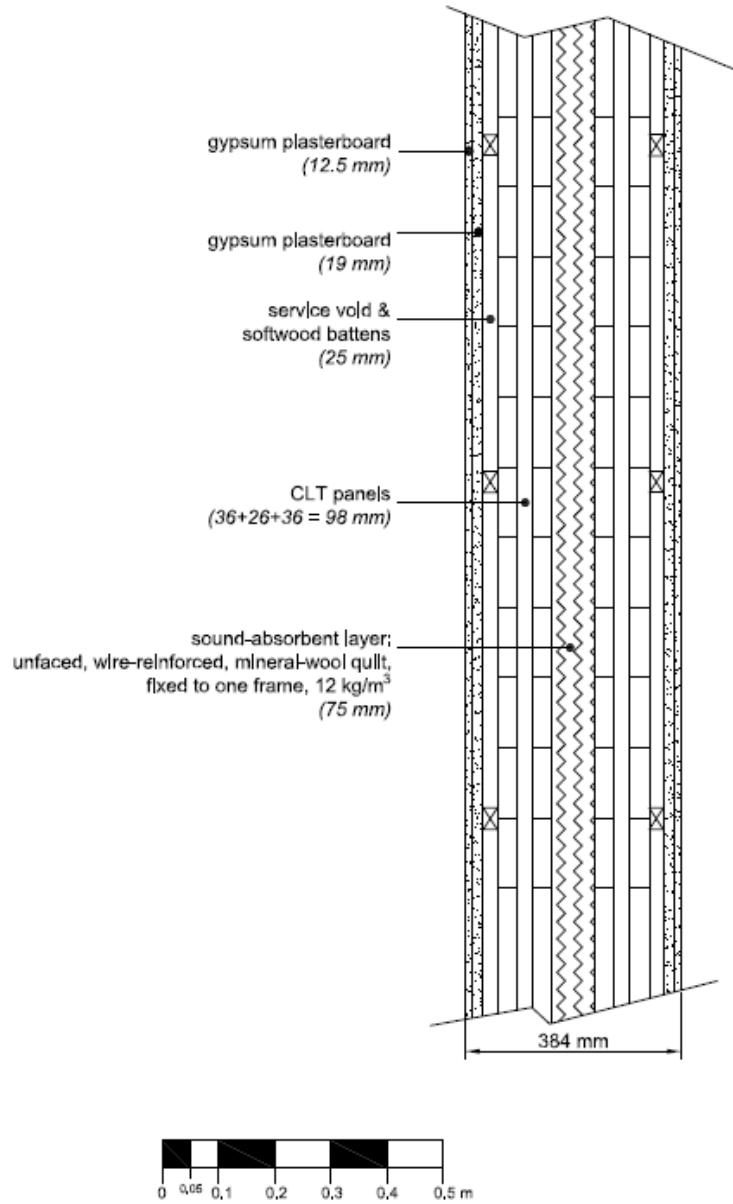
Party wall D (cross-laminated timber (CLT)), horizontal section.
